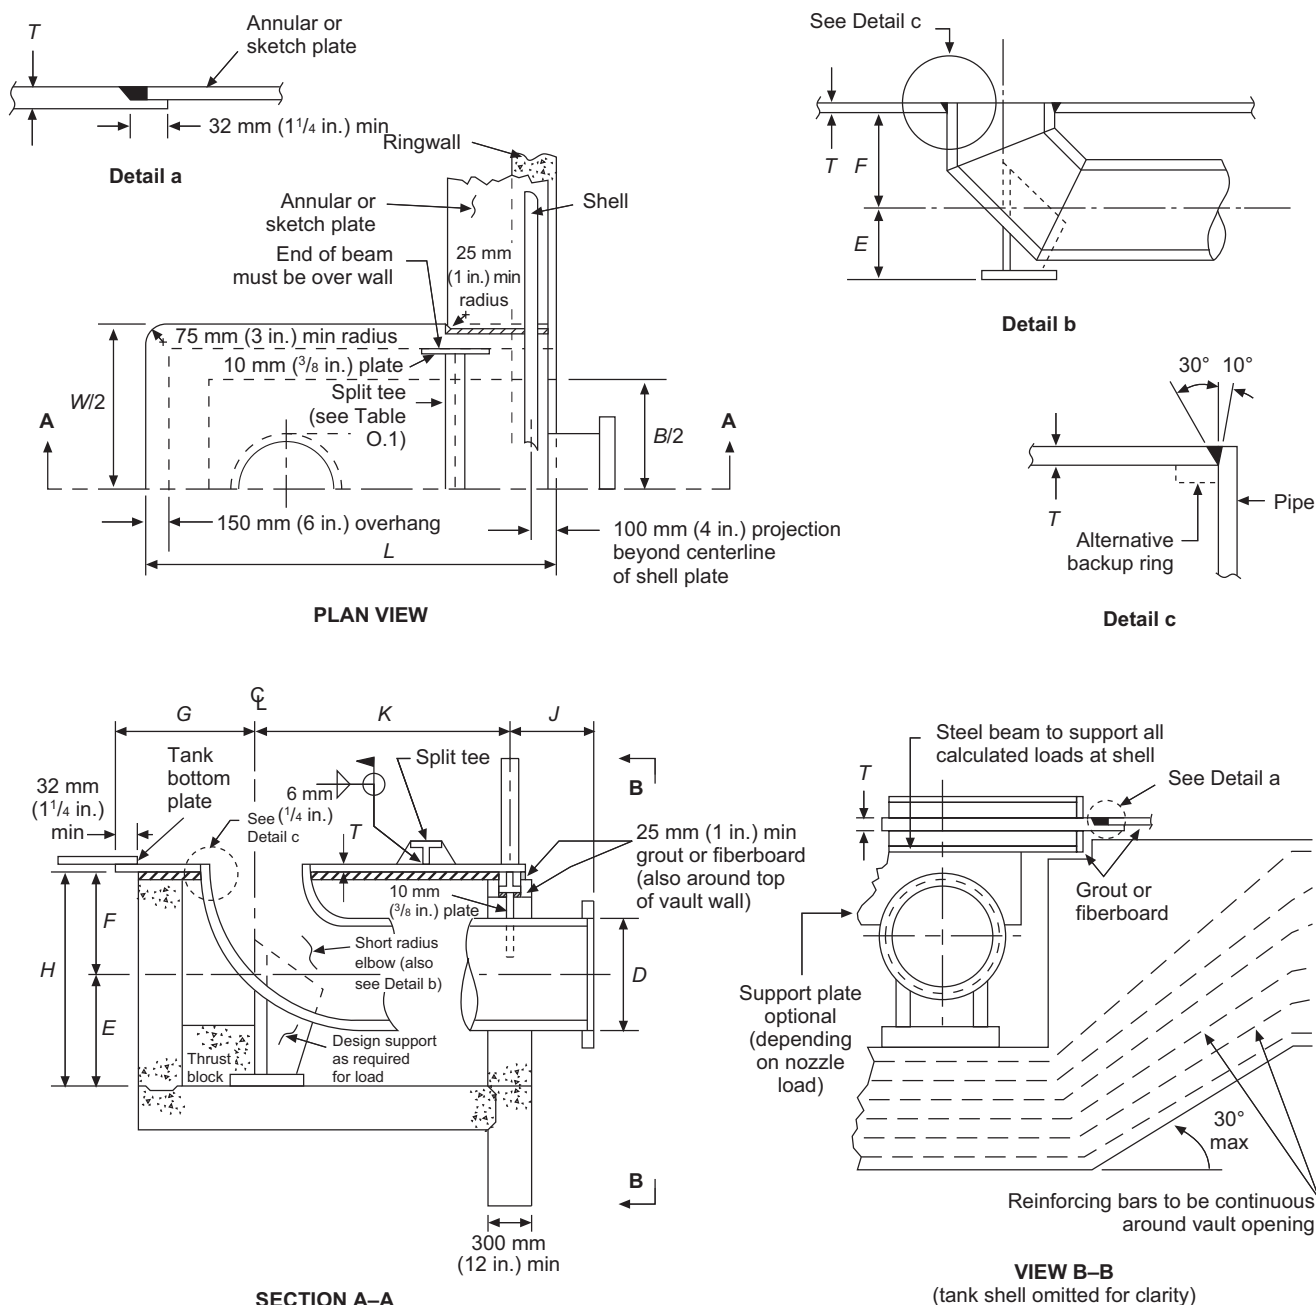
Example of Under-Bottom Connection with Concrete Ringwall Foundation
